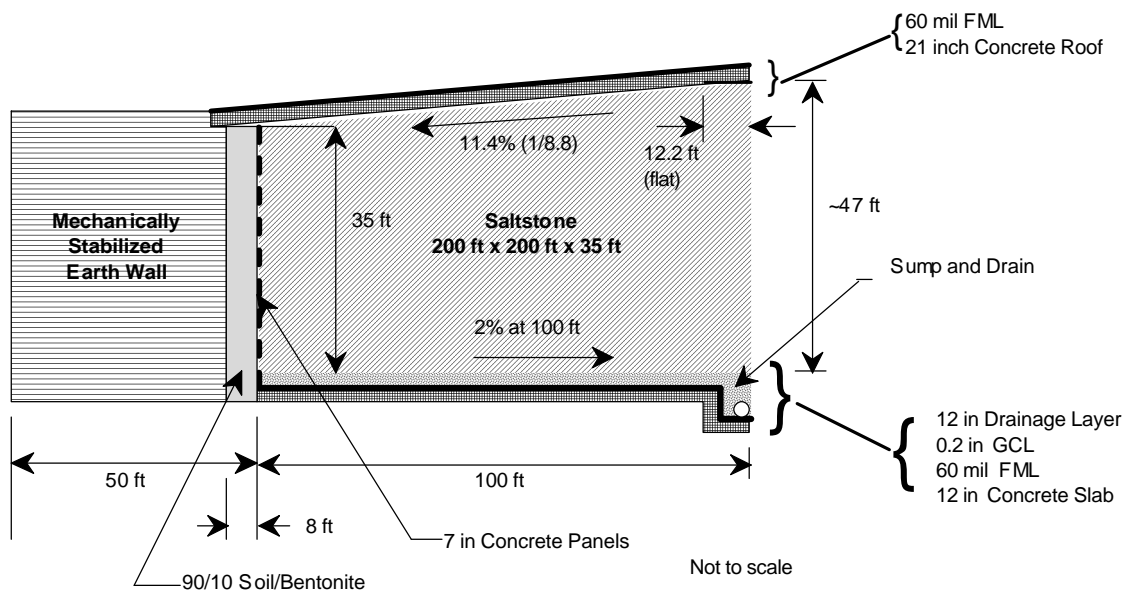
Saltstone Disposal Facility MSE Vault
